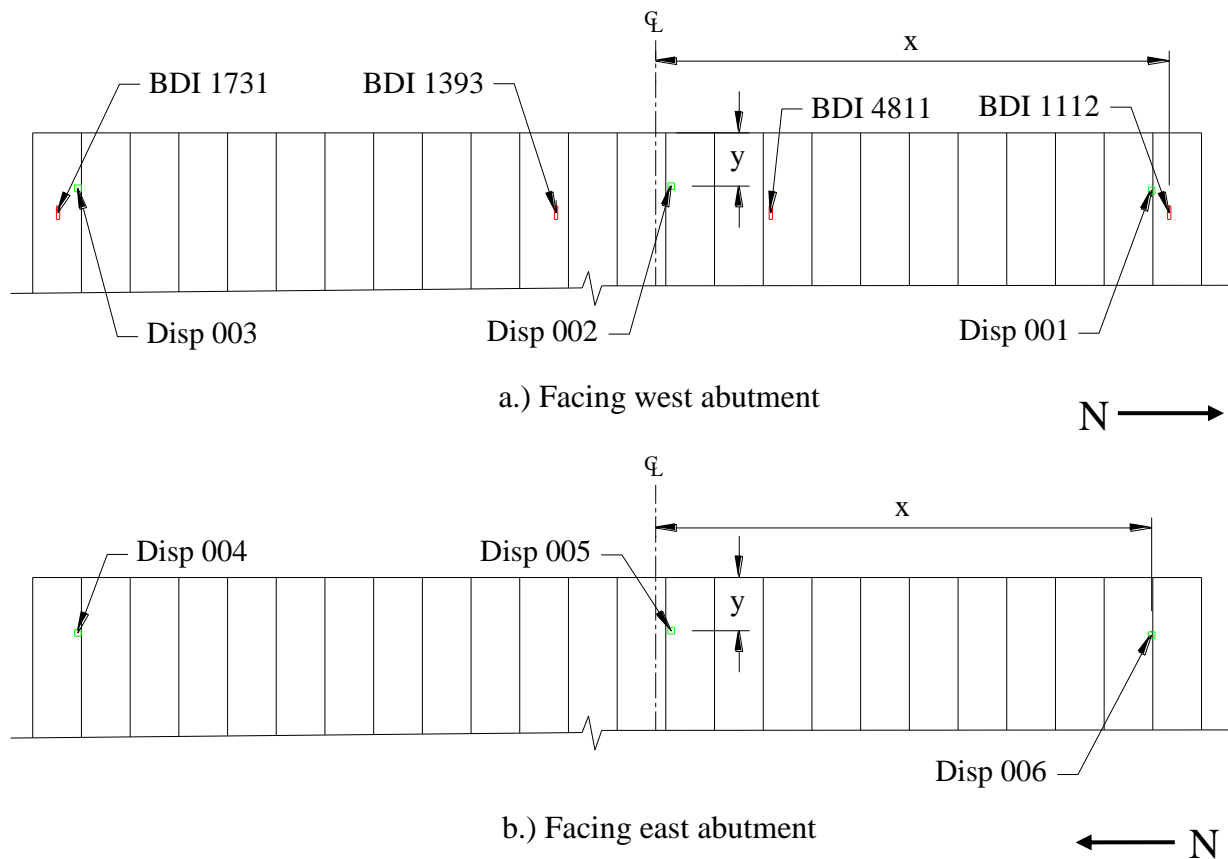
Locations of instrumentation on sheet pile walls for temporary system during live load testing
